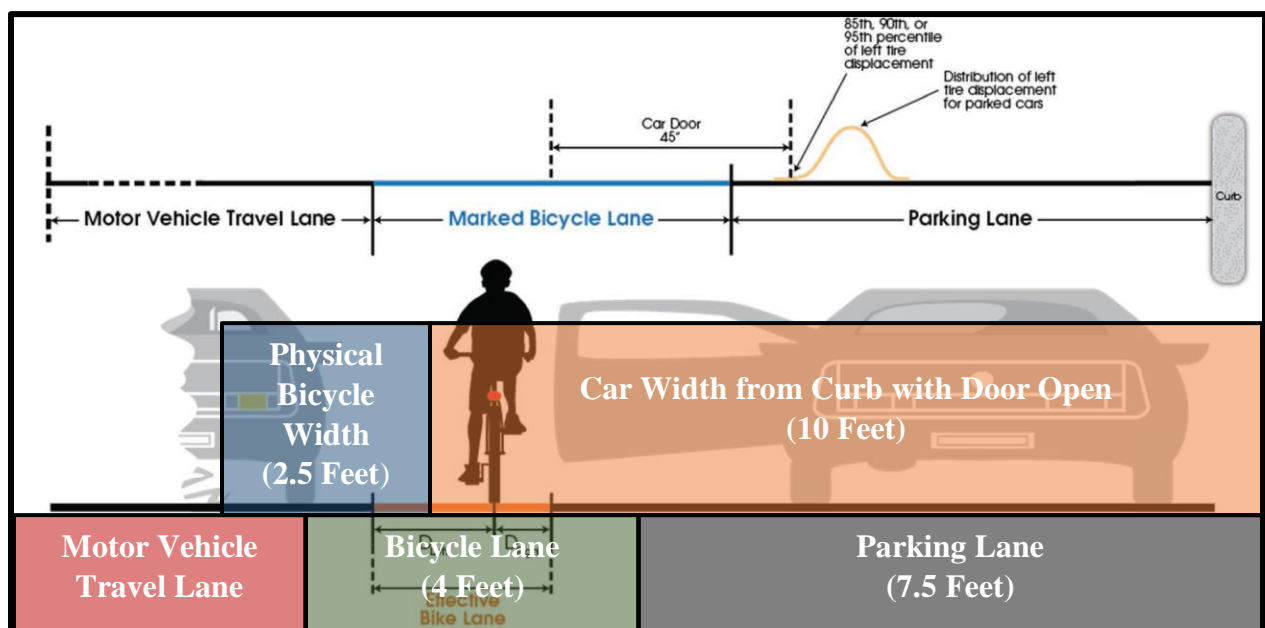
Actual Roadway Cross-Section and Utilization with Bicycle Lane and On-Street Parallel Parking (Torbic, 2014)
